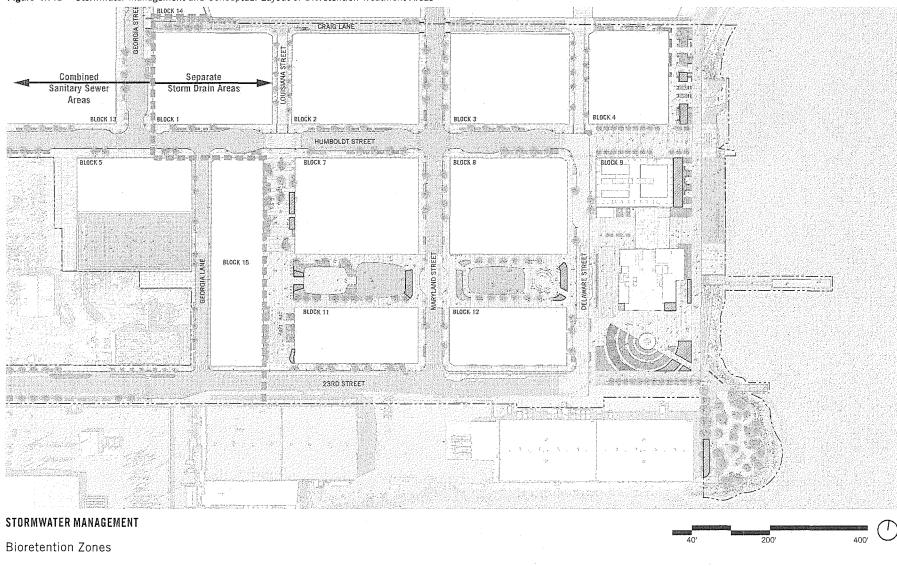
Stormwater Management and Conceptual Layout of Bioretention Treatment Areas
